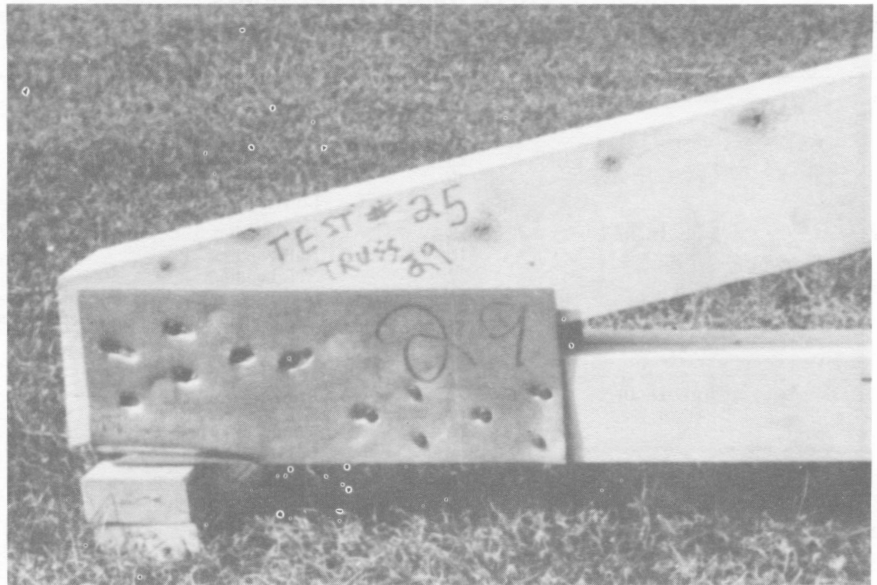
Series A steel tests typical failure, due to tearing elongation of the nail hole.
